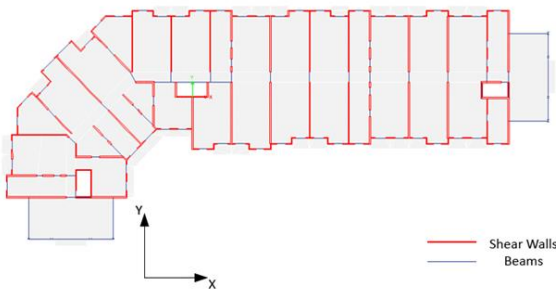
Schematic Plan View of Building B (Semi L-Shaped Building)
